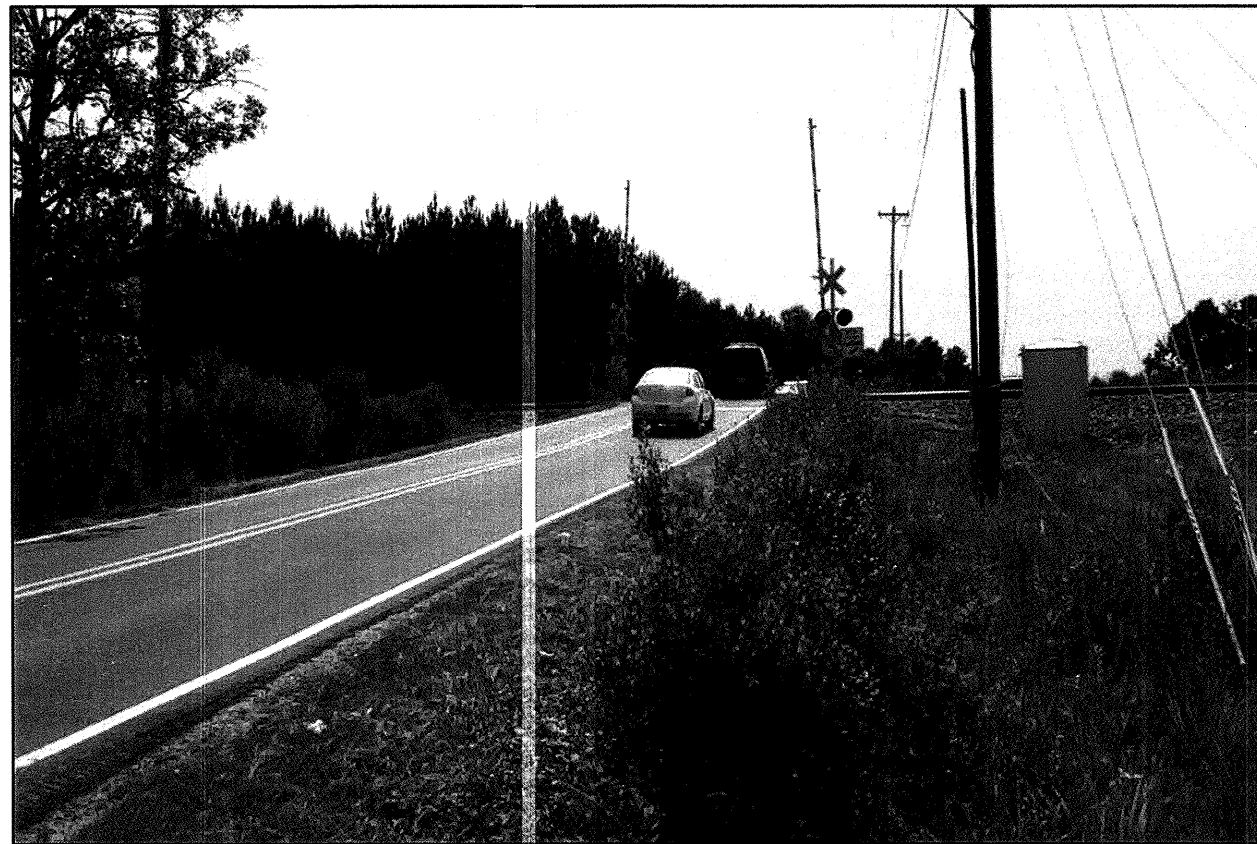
LOOKING WEST ALONG HOPSON ROAD AT EXISTING AT-GRADE CROSSING. PHOTO TAKEN FROM NEAR PROPOSED GRADE SEPARATION LOCATION EAST OF EXISTING TRACKS.
